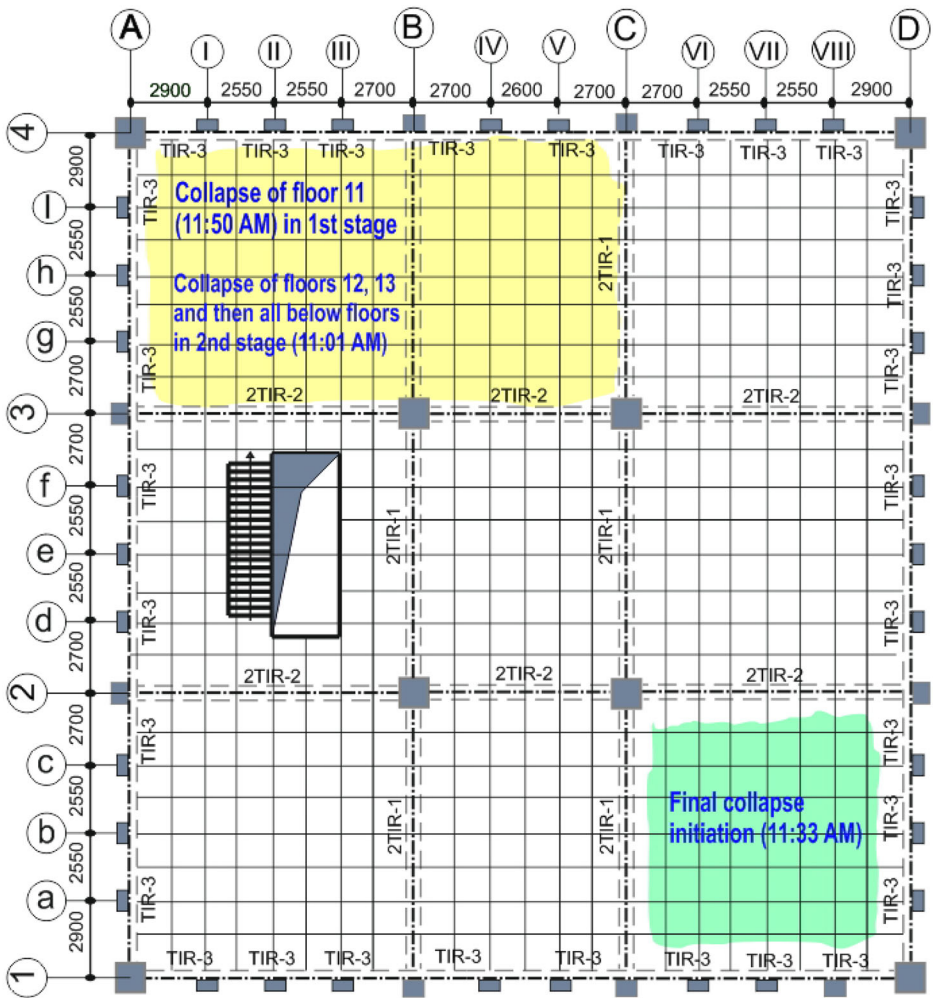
The collapsed area of floor 11 in the first stage (unit: mm).
